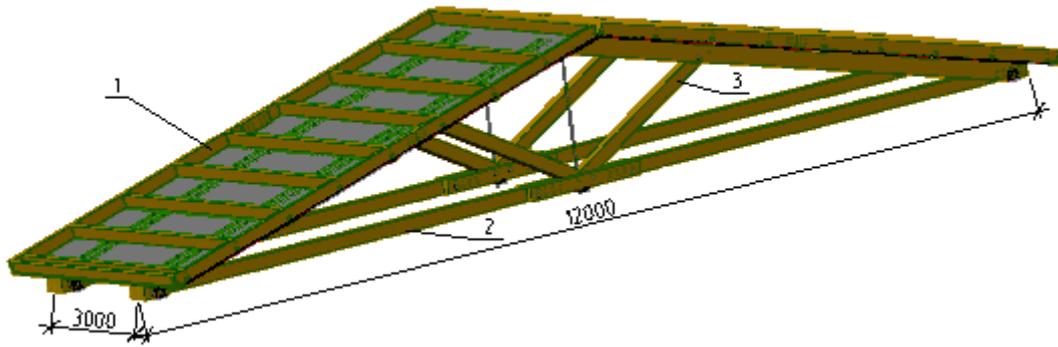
The all-wooden truss unit with the top boom in the form of the slabs with asbestos-cement boarding for the heated buildings
